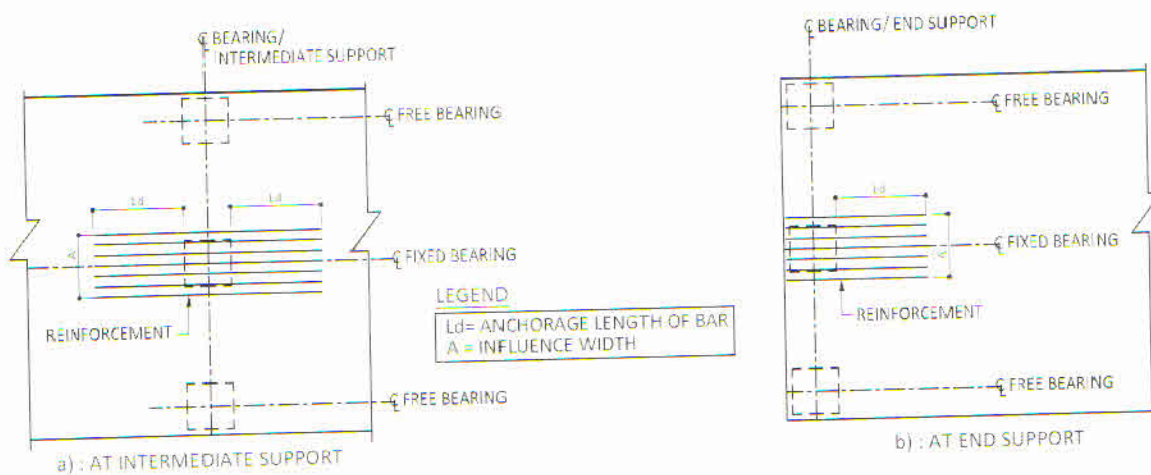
ARRANGEMENT OF TIE BACK REINFORCEMENT AT FIXED BEARING
